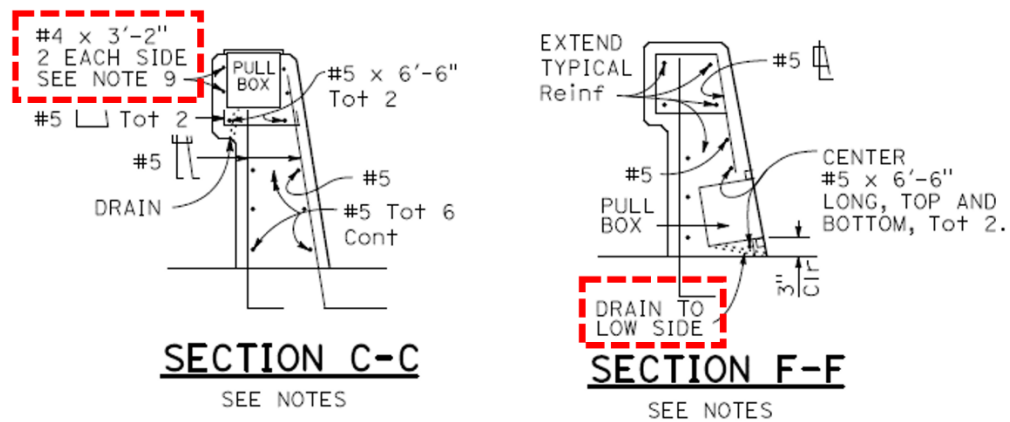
Examples of Barrier Modifications: Installation of Drain and Additional Rebar for Pull Box Placement
